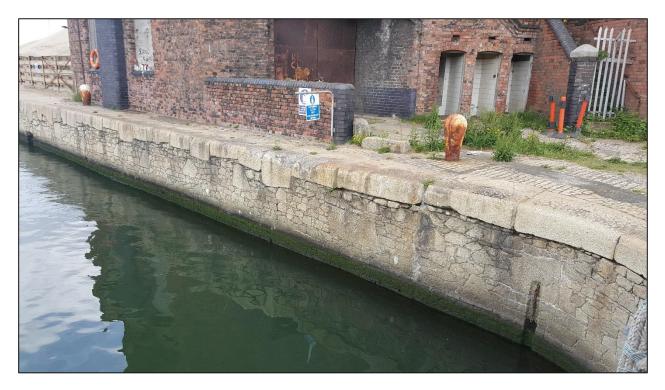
View of dock wall construction on northern wharf, next to the Hydraulic Engine House
